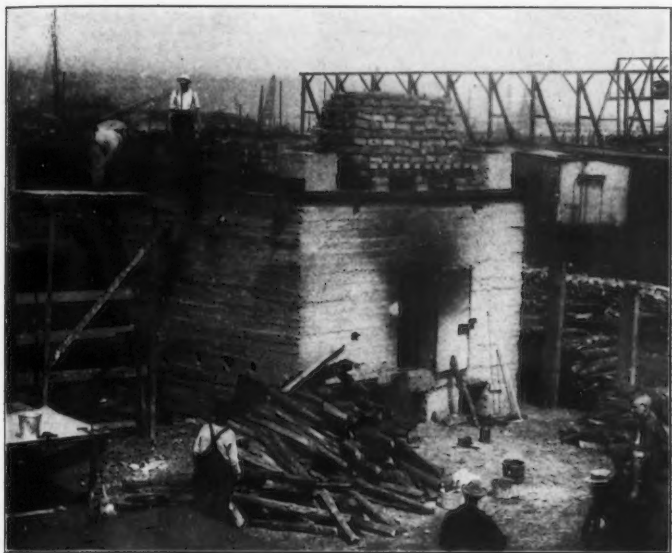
CINDER CONCRETE TEST HOUSE AFTER FOURTH FIRE.
